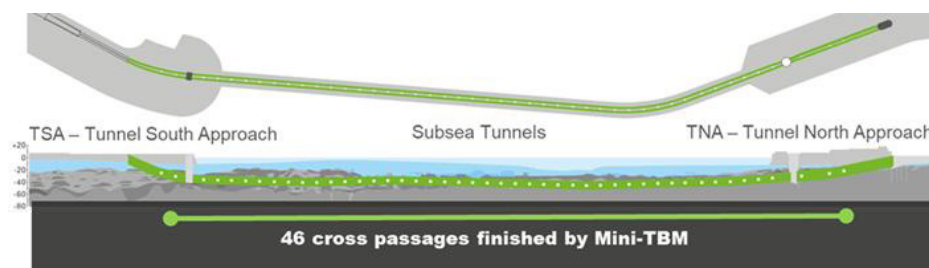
Twin-tube road tunnels and cross passage location along the tunnel route
